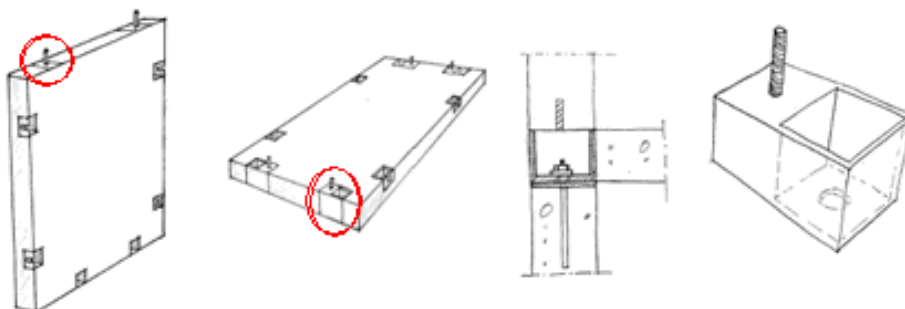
Connection used to connect floor elements to wall elements, Consolis (2007).
